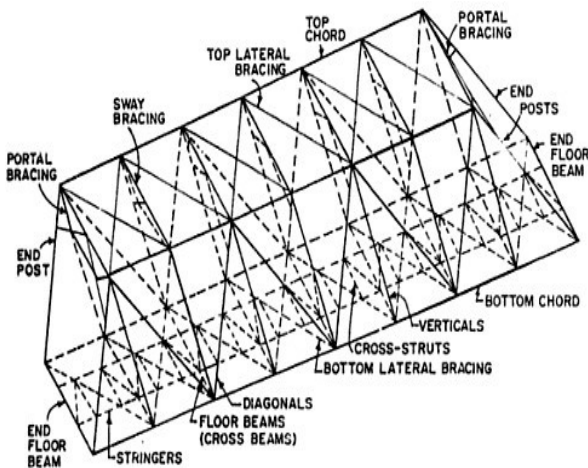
Diagrammatic View of a Through Type Truss Girder Bridge
